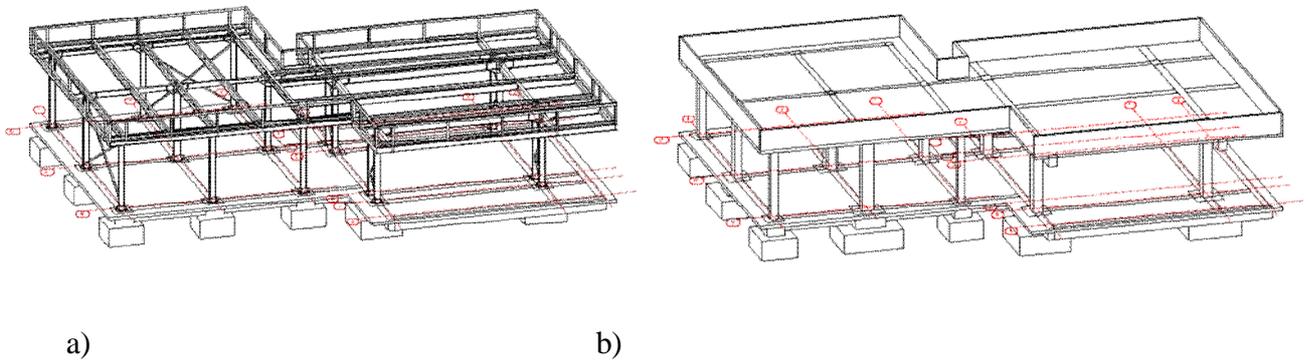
/ Image 2. a) Metal structure. b) Reinforced concrete structure
